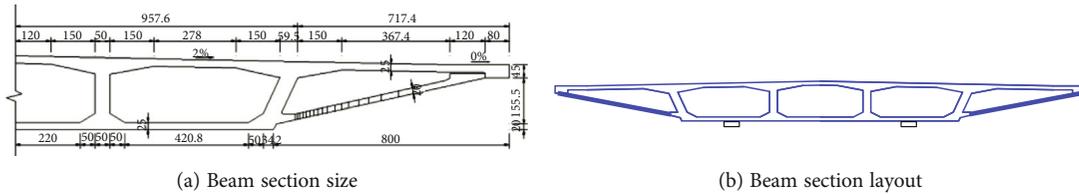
Cross-section diagram of the large-span wide concrete box girder.
